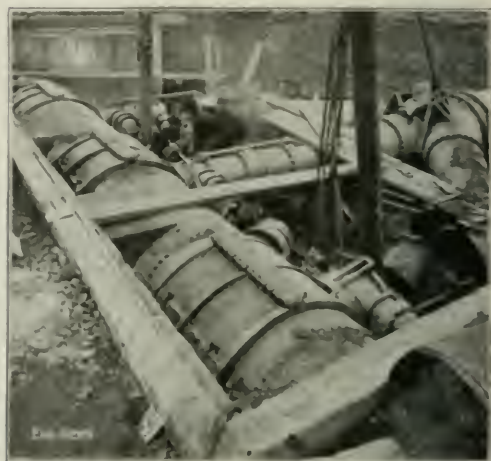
CONNECTING 60-IN. STEEL WATER MAINS AT PITTSBURGH, WITH MAIN UNDER PRESSURE; LOOKING SOUTHWEST
